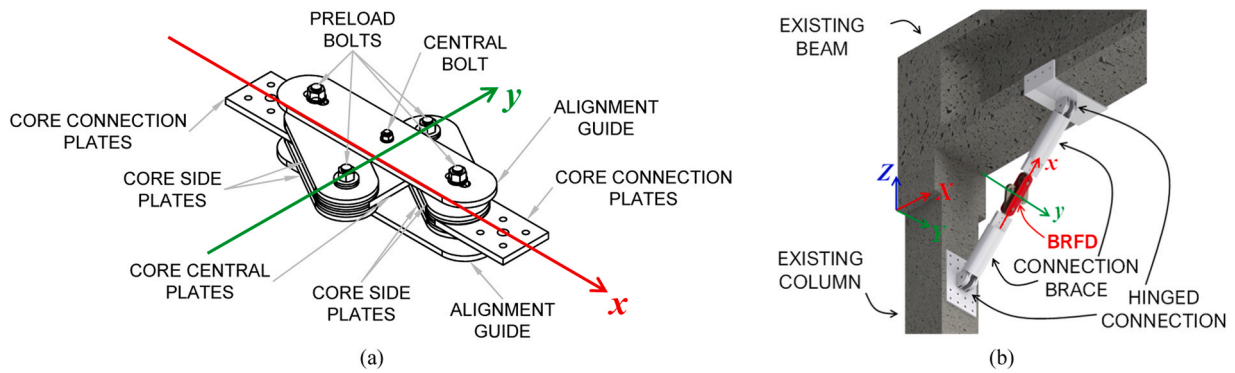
BRFD (a) axonometric view and (b) example of installation as a beam-to-column joint.
